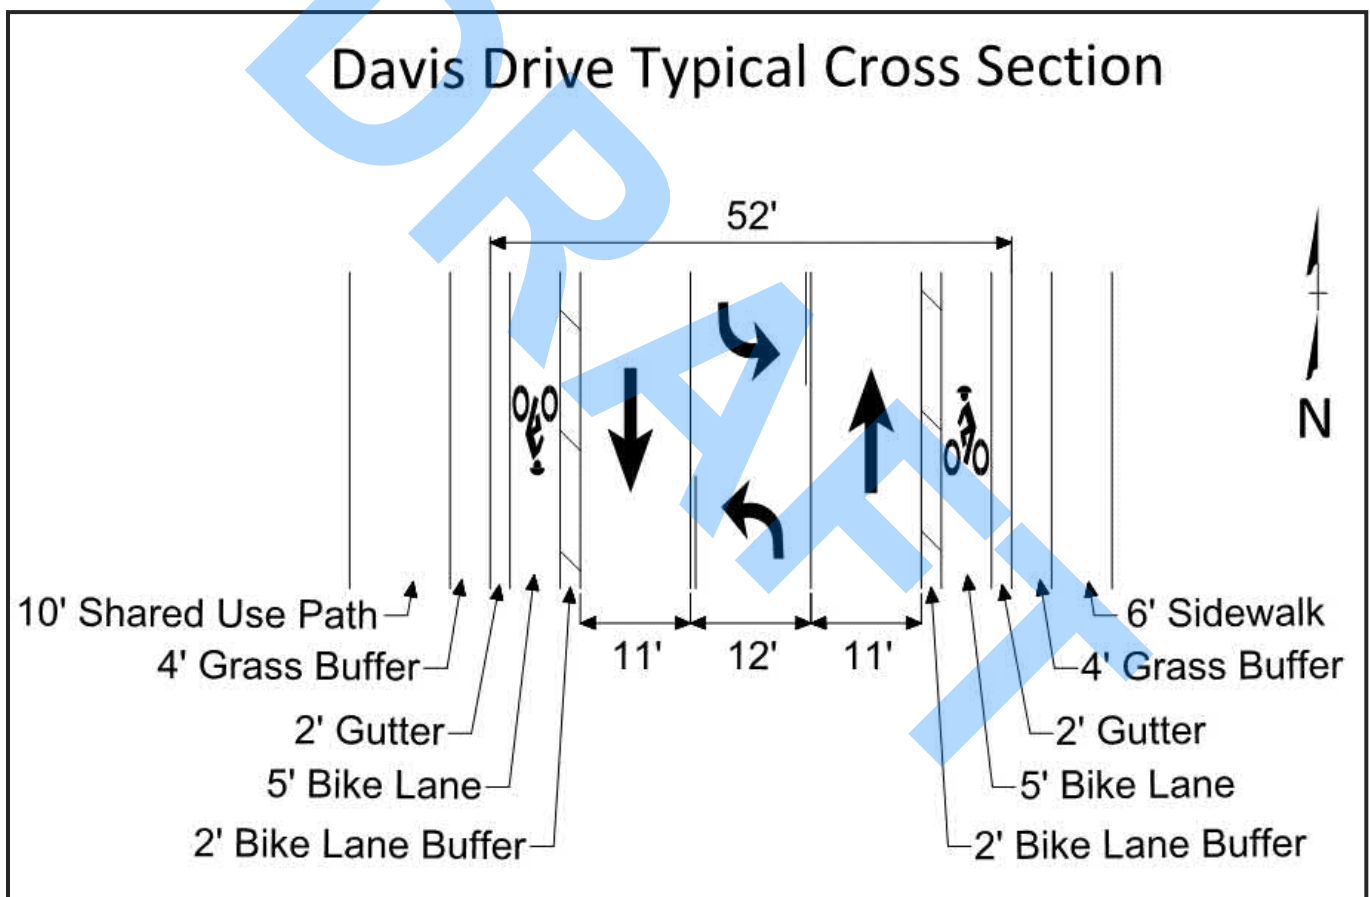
Typical Cross Section of the Davis Dr. Corridor Improvements
